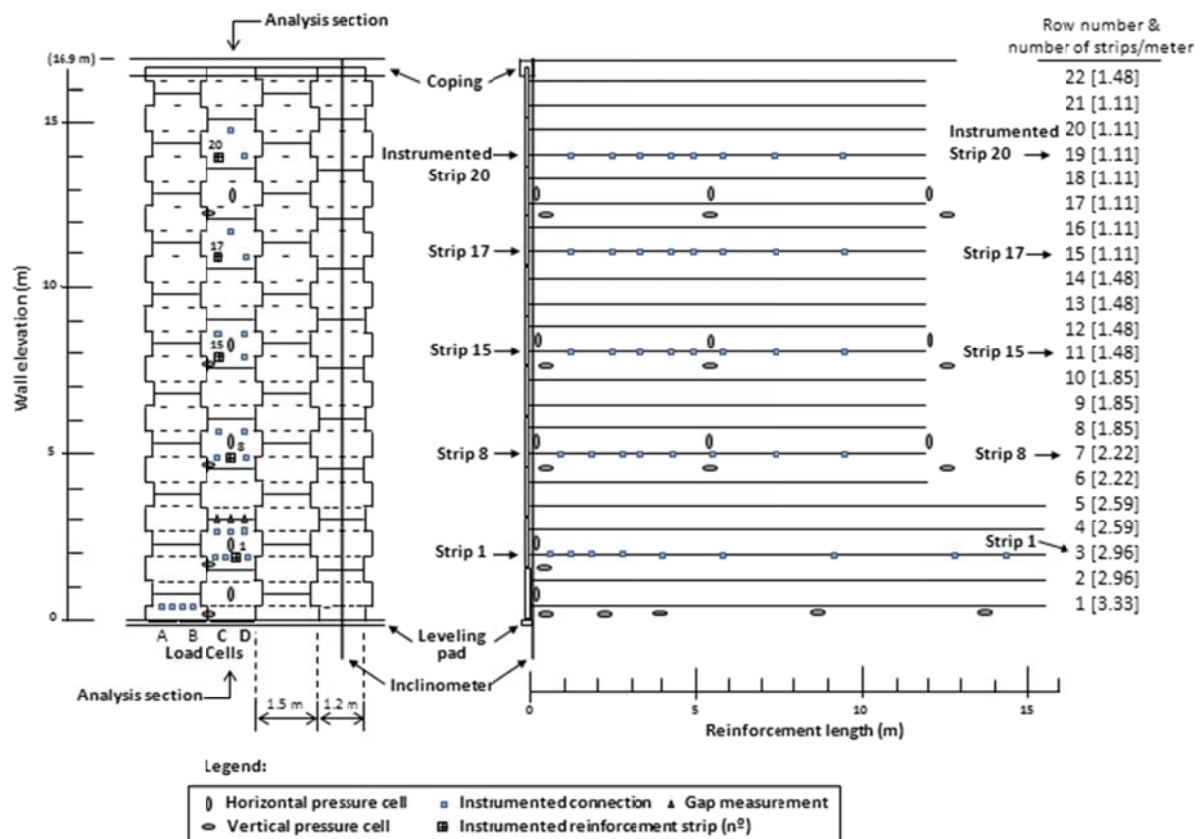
Elevation and cross-section views of instrumented wall (after Runser et al., 2001).
